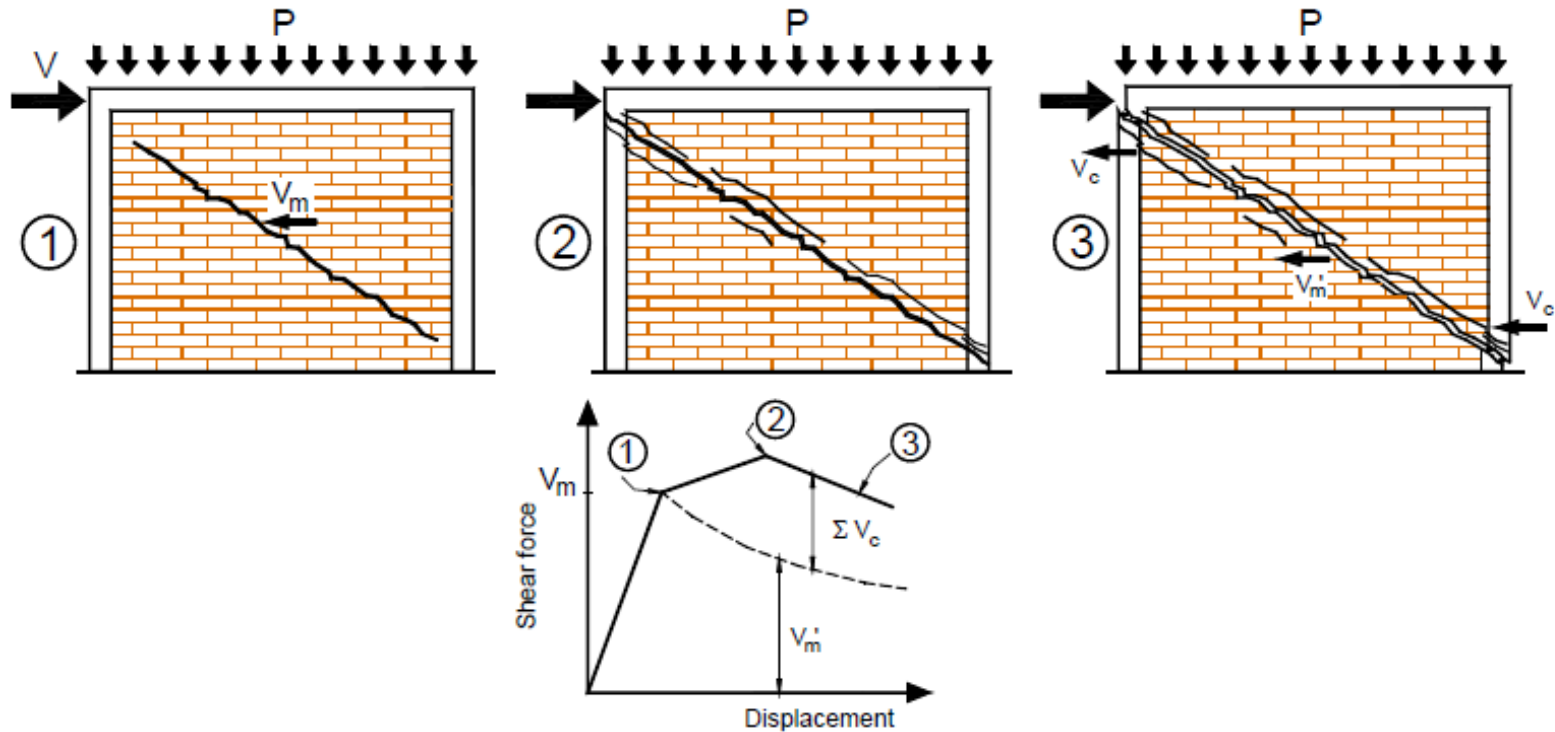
Mechanism of shear resistance for a confined masonry wall panel: 1) diagonal cracking in the masonry wall; 2) diagonal cracks have propagated from the wall into the tie-columns, and 3) shear failure of the RC tie-columns and the confined masonry wall panel.
